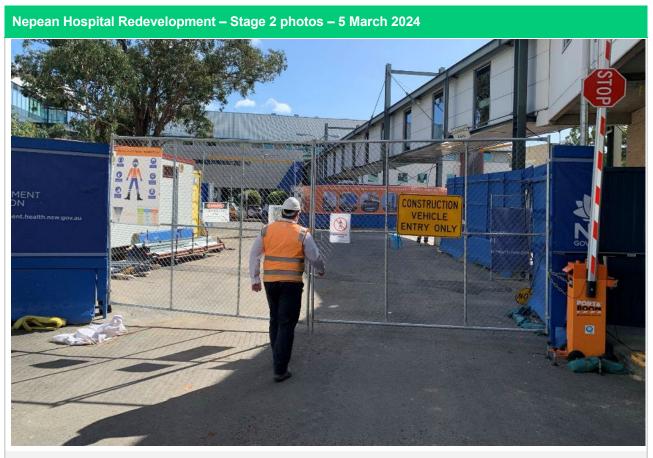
Access to the site free of obstacles. Traffic controls in place for heavy vehicle access.
